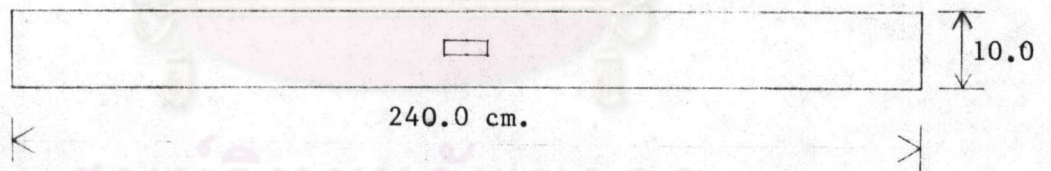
Compression Face of a Test Beam with an Electrical Strain Gage (top view)
